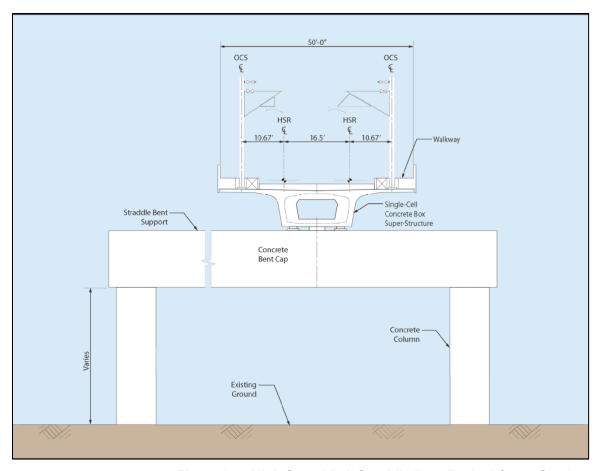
High-Speed Rail Straddle Bent Typical Cross Section
